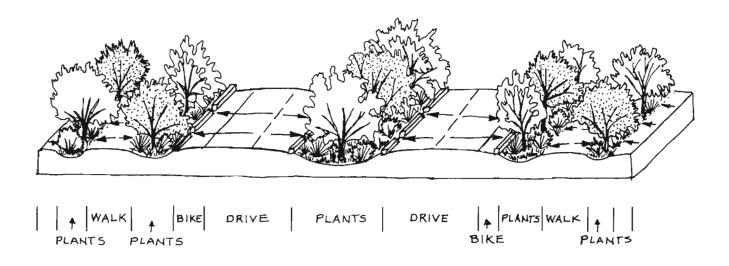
Raised berm accessways and sunken basin planting areas
